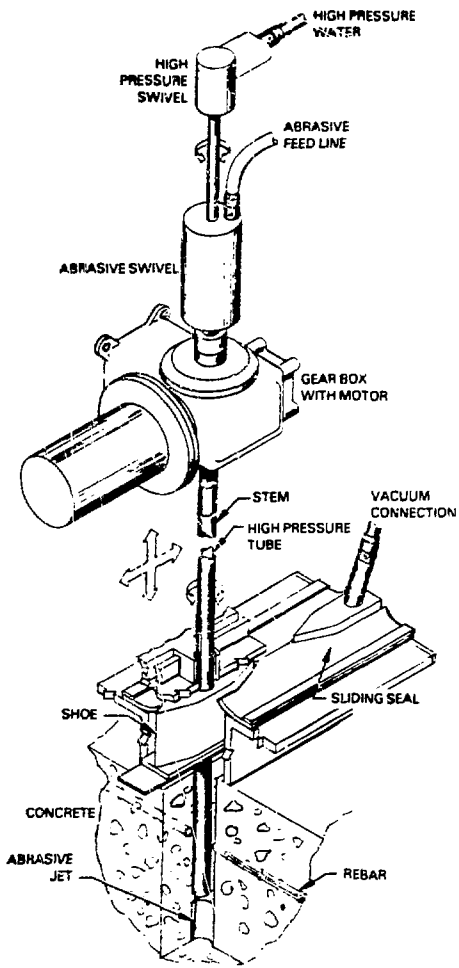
Abrasive-Waterjet Deep Kerf Tool
